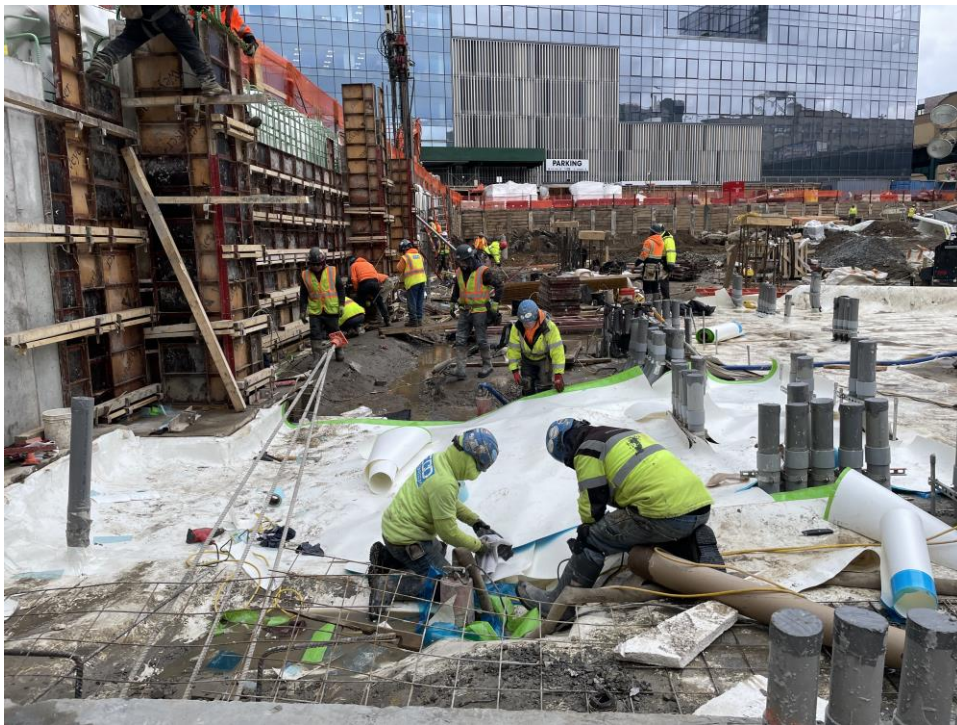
ECD installing waterproofing in the northeastern part of the site (facing south).
